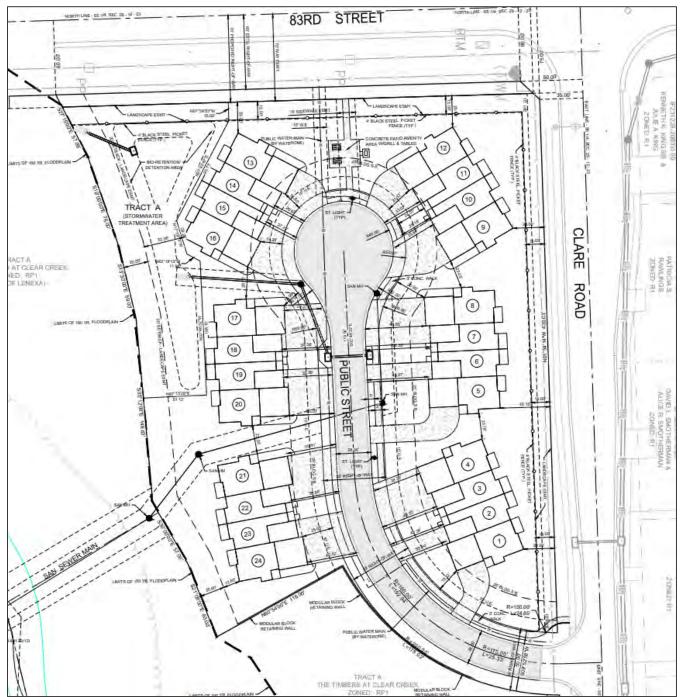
Approved Preliminary Plan and Plat, PT22-13P.
